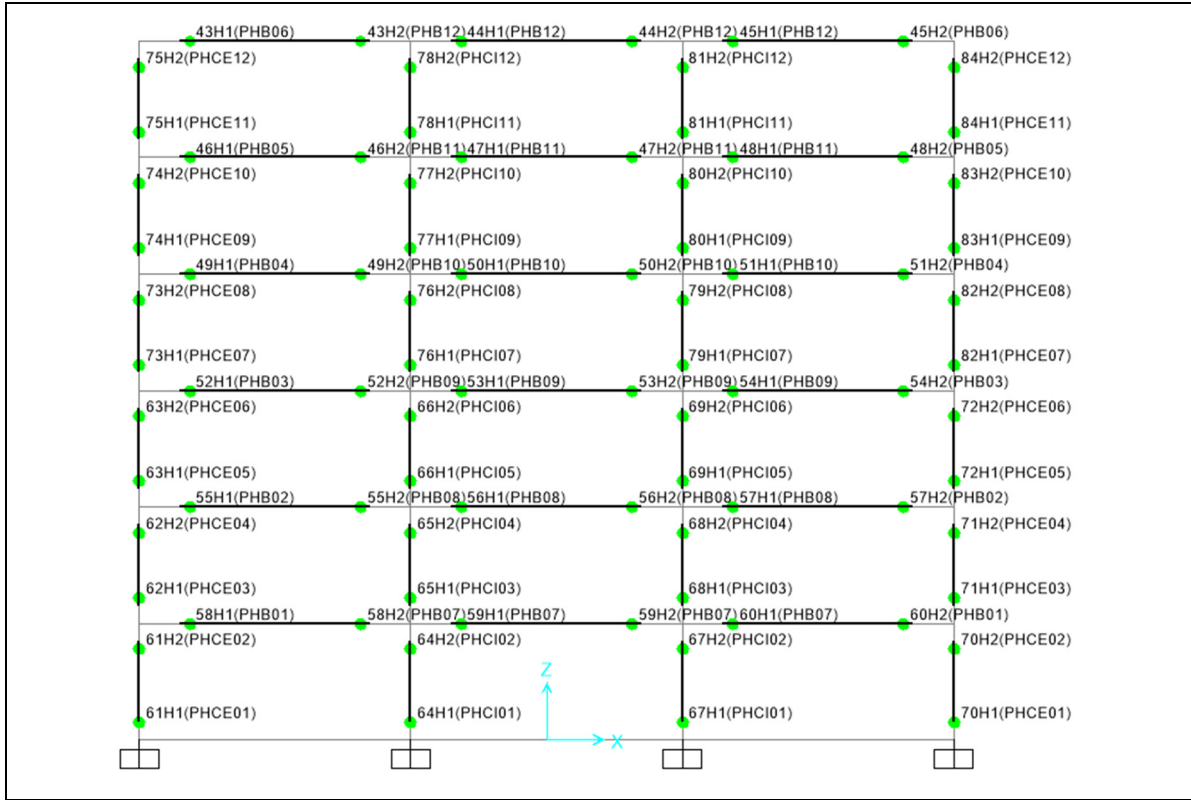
Configuration of concentrated hinges for the 6-storey frame building
